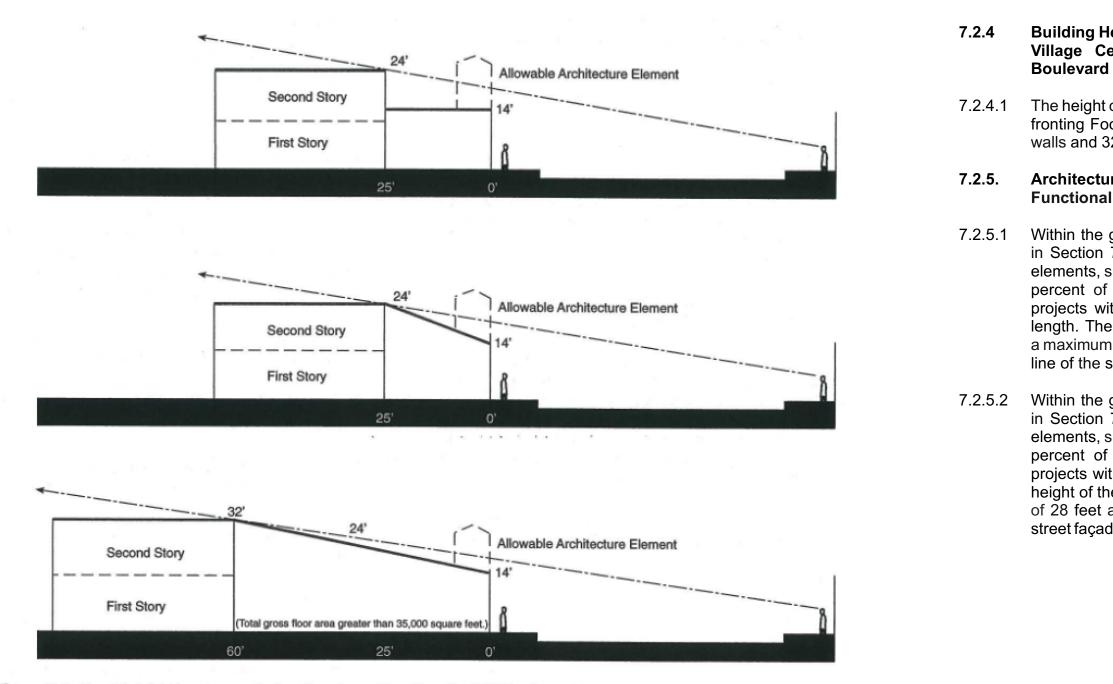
Roof Height Requirements for Structures Fronting Foothill Boulevard in the Village Center
